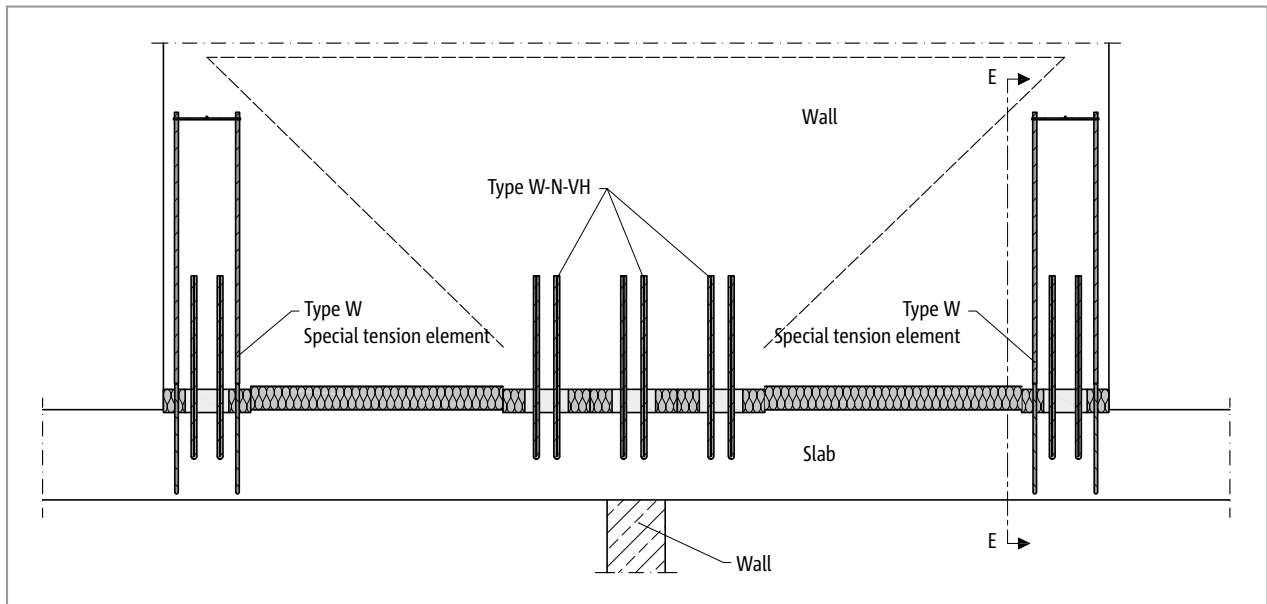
Schöck Sconnex® type W: Combined product variants in the application case of intersecting walls
